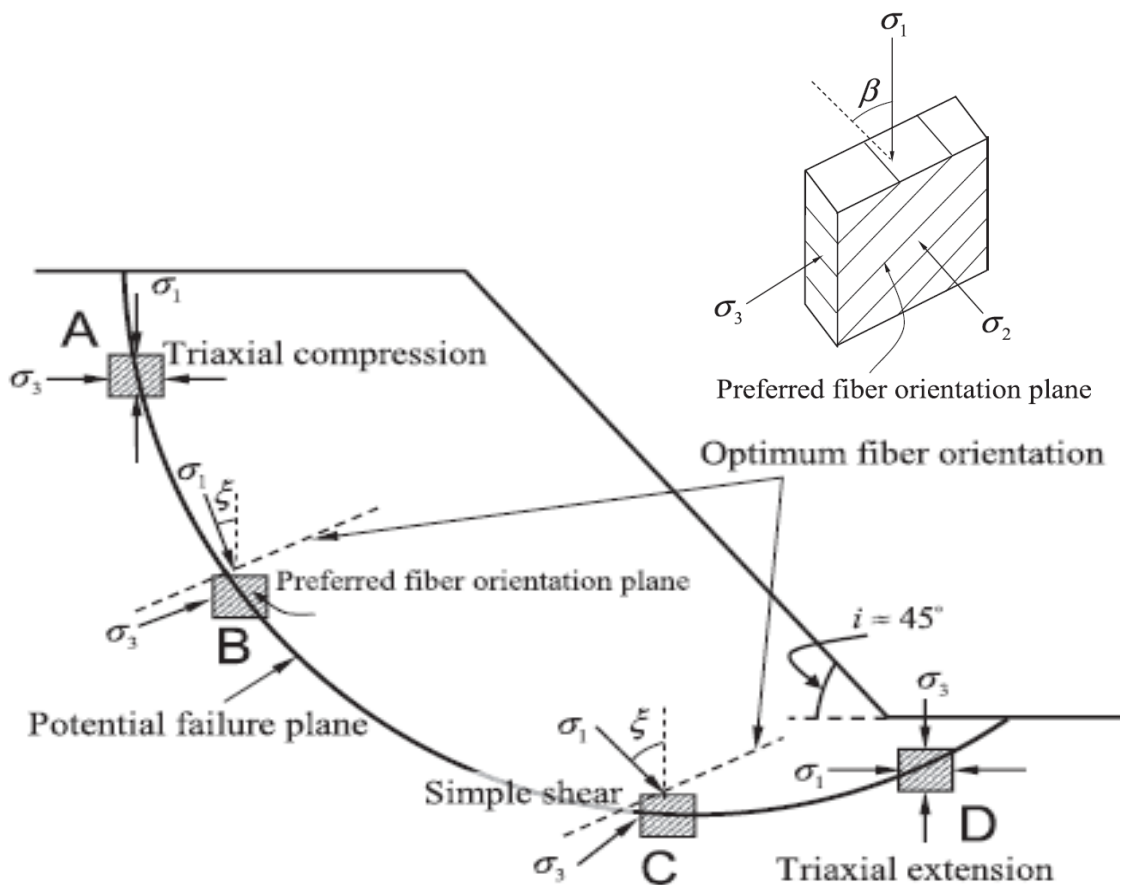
Fibre orientation plane and relative loading direction in slope failure (Gao and Zhou 2013)
